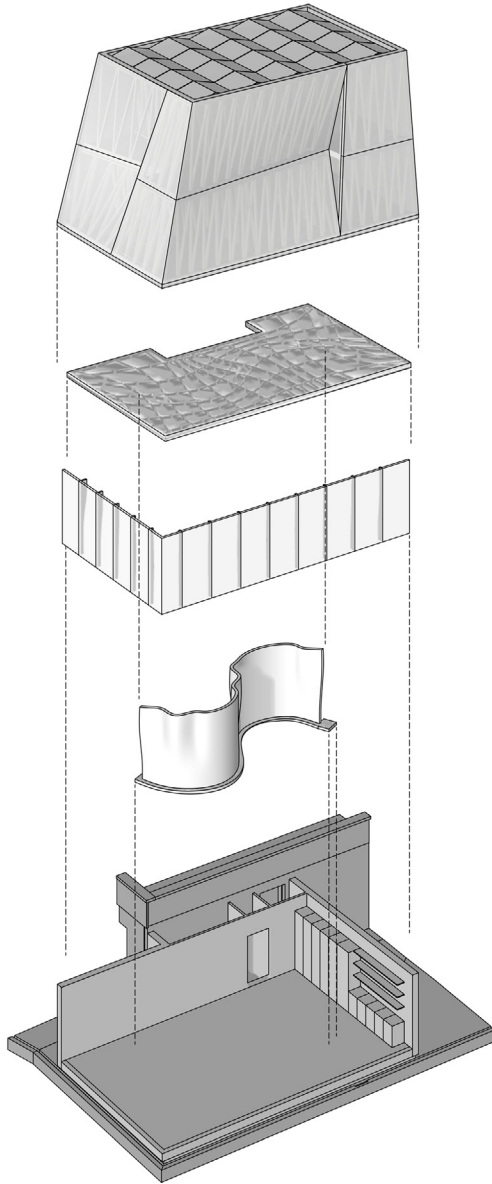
The exploded view [Griffiths, A., n.d.]
